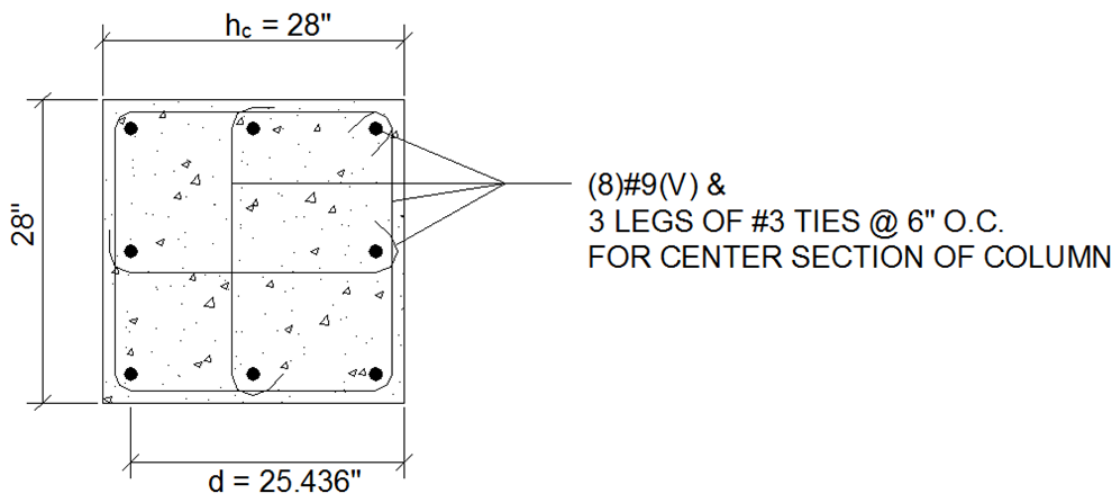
Exterior column, cross-section at center of column at 2nd – 6th floor levels based on SDC D design.
